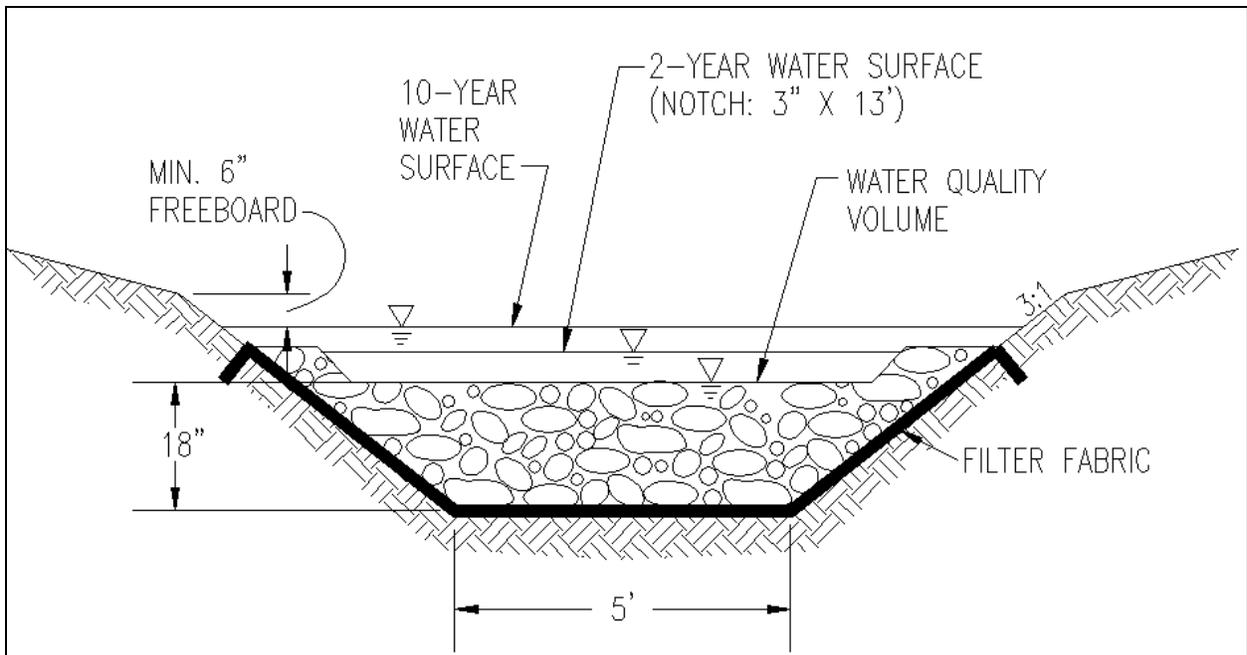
Cross-Sectional View of Example Swale
